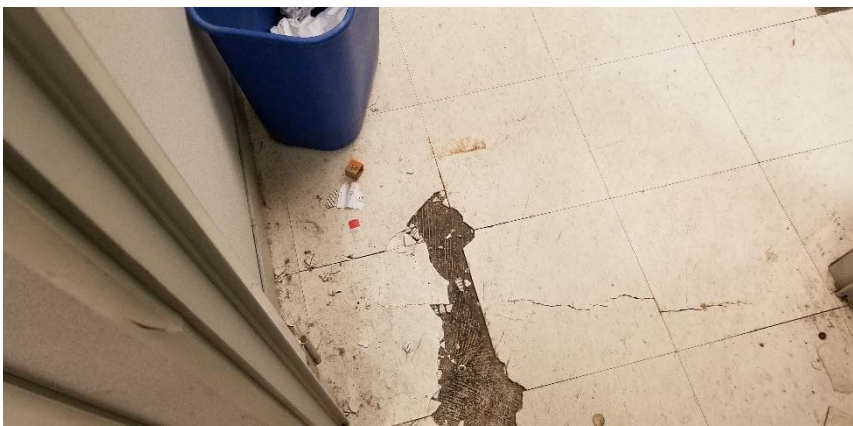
View of asbestos-containing vinyl floor tile (12"x12"-White with beige spots) observed to be in poor condition in Room C144.
